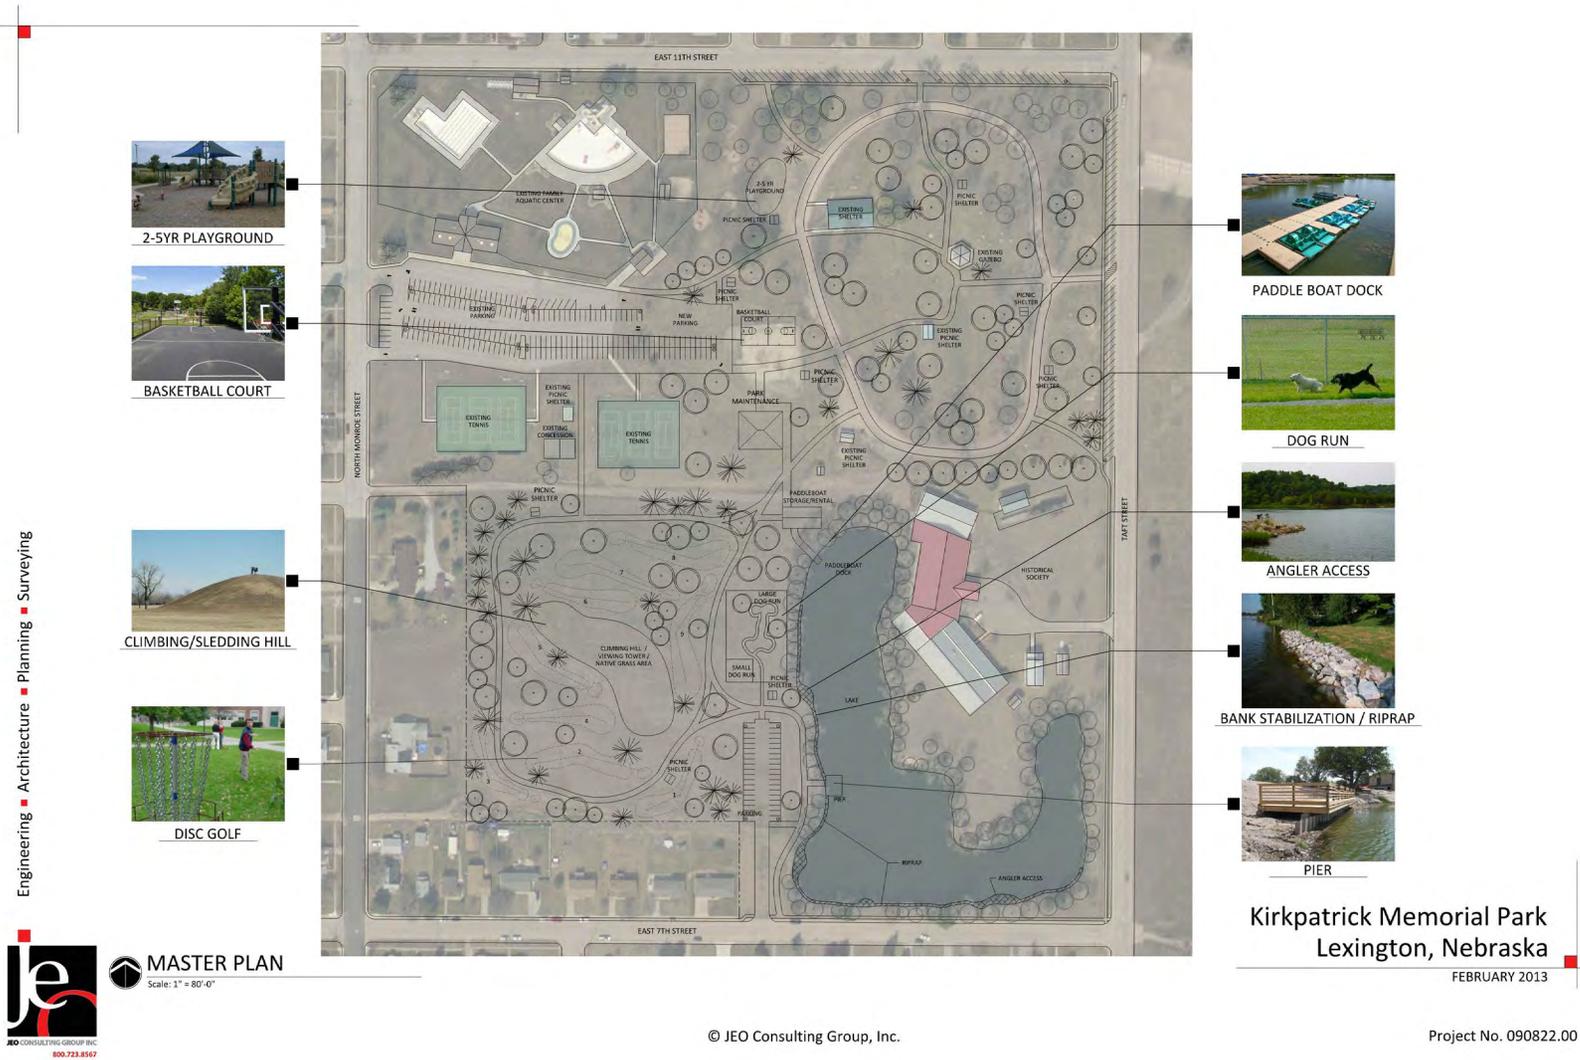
Kirkpatrick Memorial Park proposed Master Plan, Lexington
